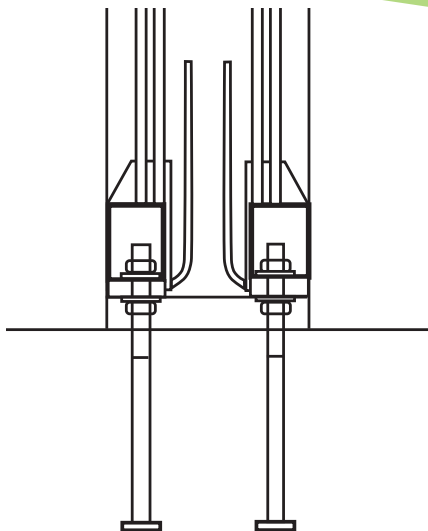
BOLTED PRECAST COLUMN CONNECTION WITH HIGHLIGHTED RECESS BOXES
